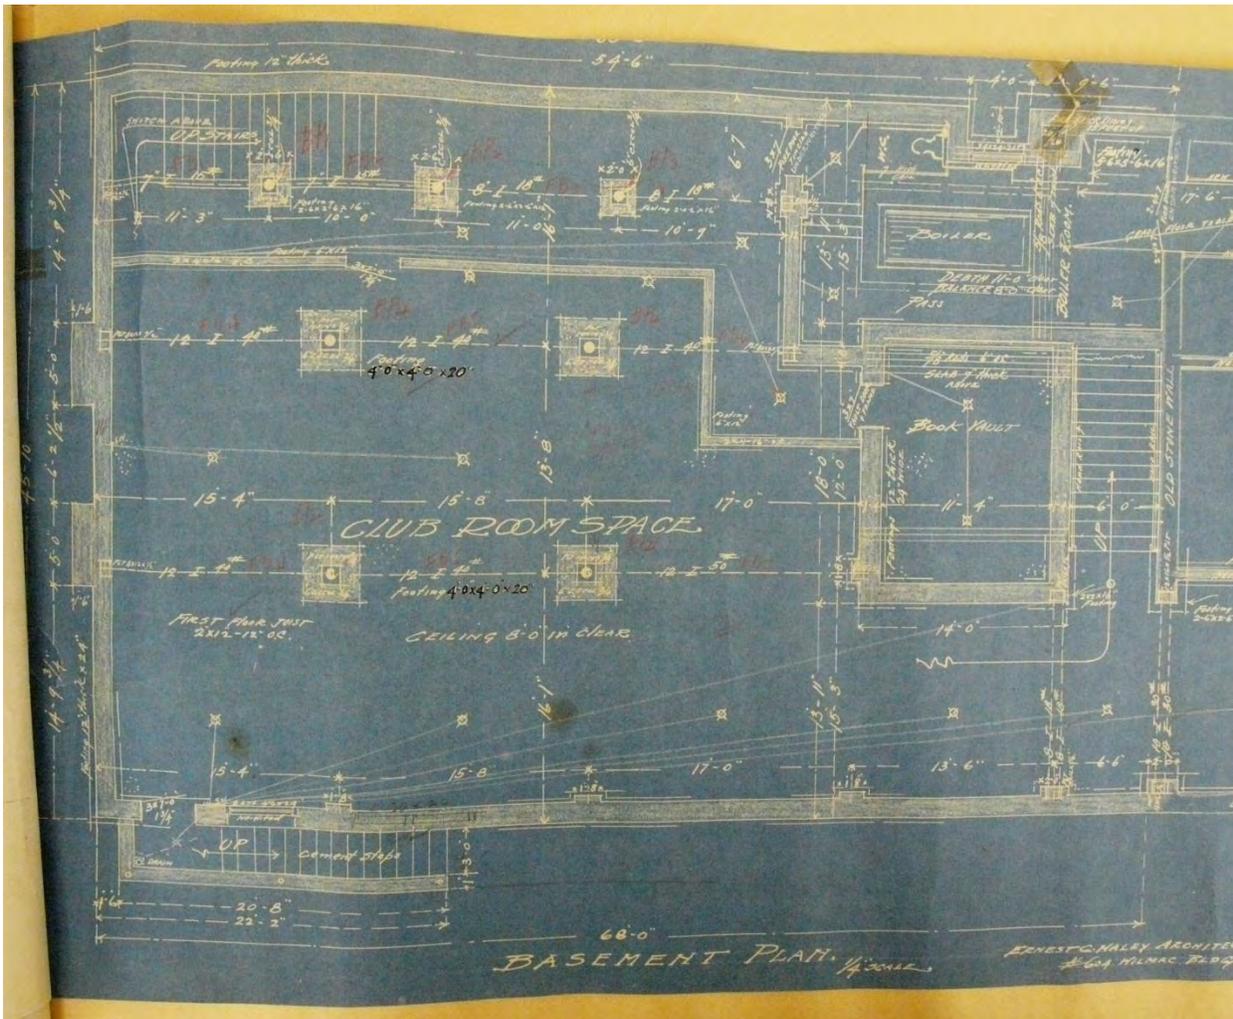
Basement floor plan 1920 addition, source: Northwest Architectural Archives
